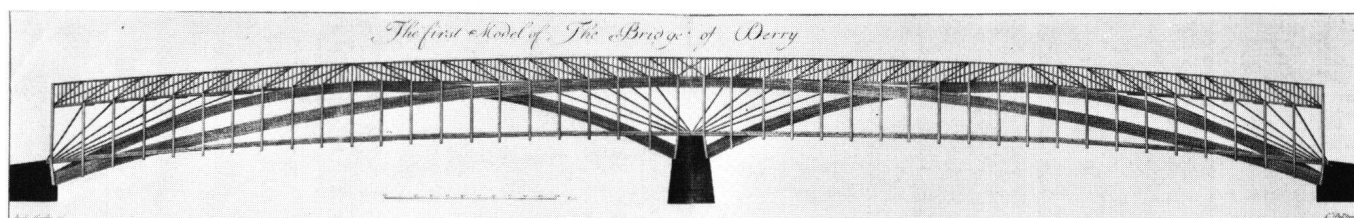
Proposed bridge over the Foyle River, Londonderry; print after Michael Shanahan showing elevation
